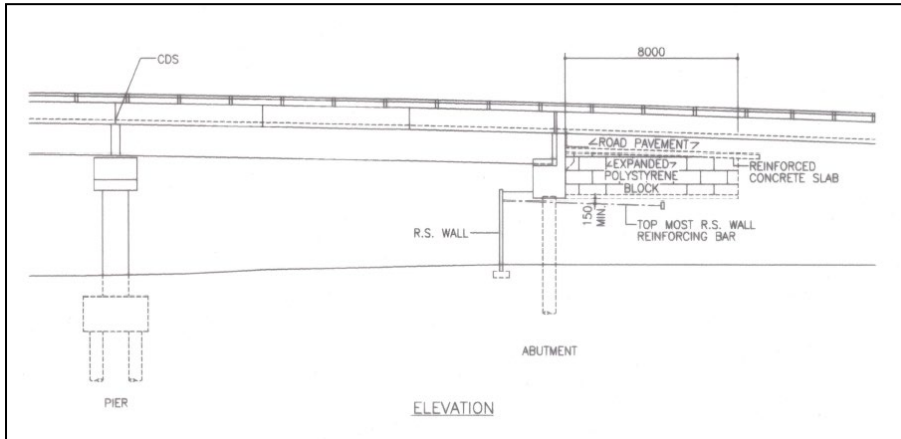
EPS section behind the bridge abutment B. (Courtesy of SKVE Holdings Sdn. Bhd.)
